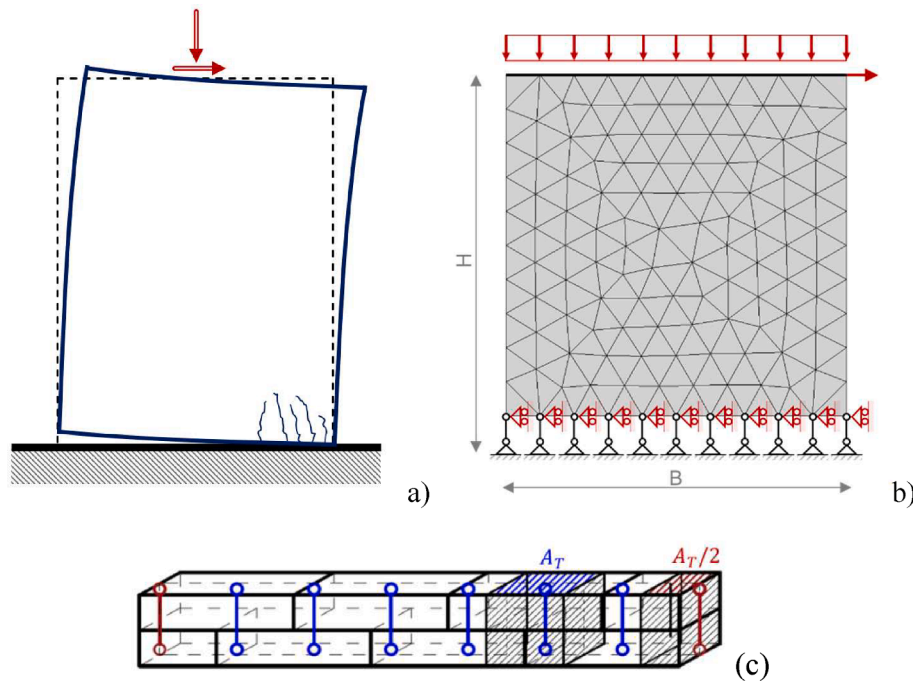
Sketch of the flexural failure in a masonry wall (a) and modelling assumptions (b). Truss spacing at the wall toe (c).
